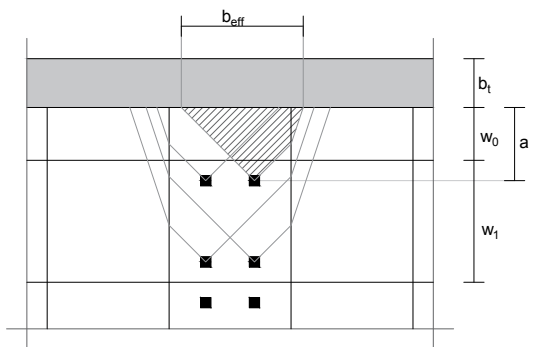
Load spreading towards the side girder at midspan in an orthotropic floor plate
